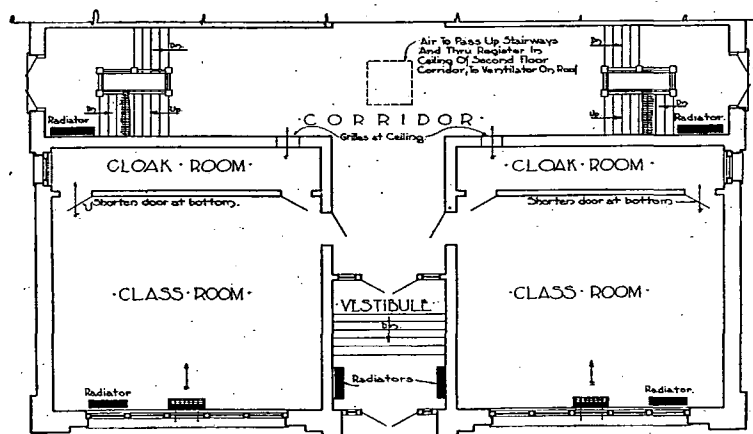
SCHOOL ROOM PLAN SHOWING LOCATION OF UNITS
